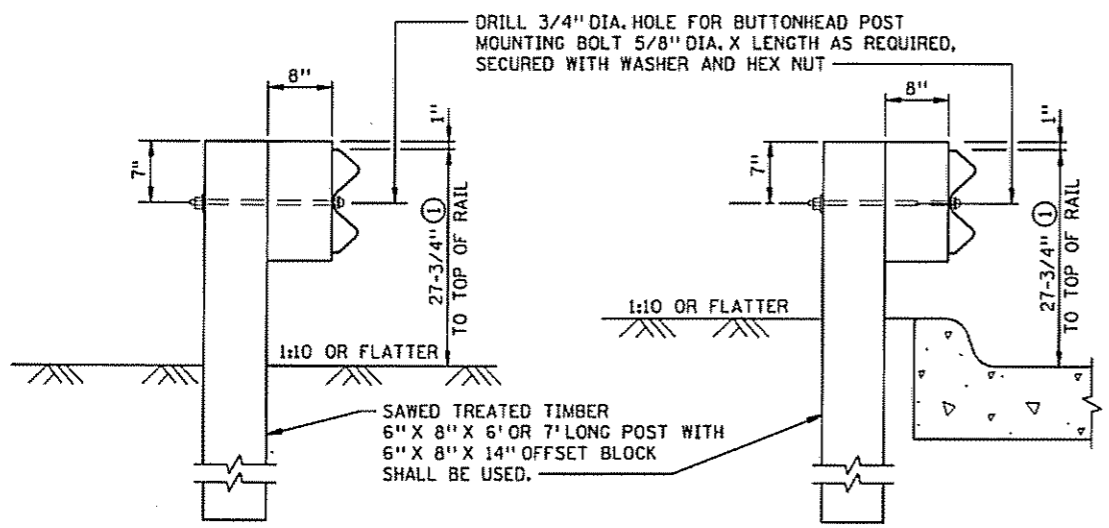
DETAILS OF W-BEAM TO THRIE BEAM TRANSITION SECTION
